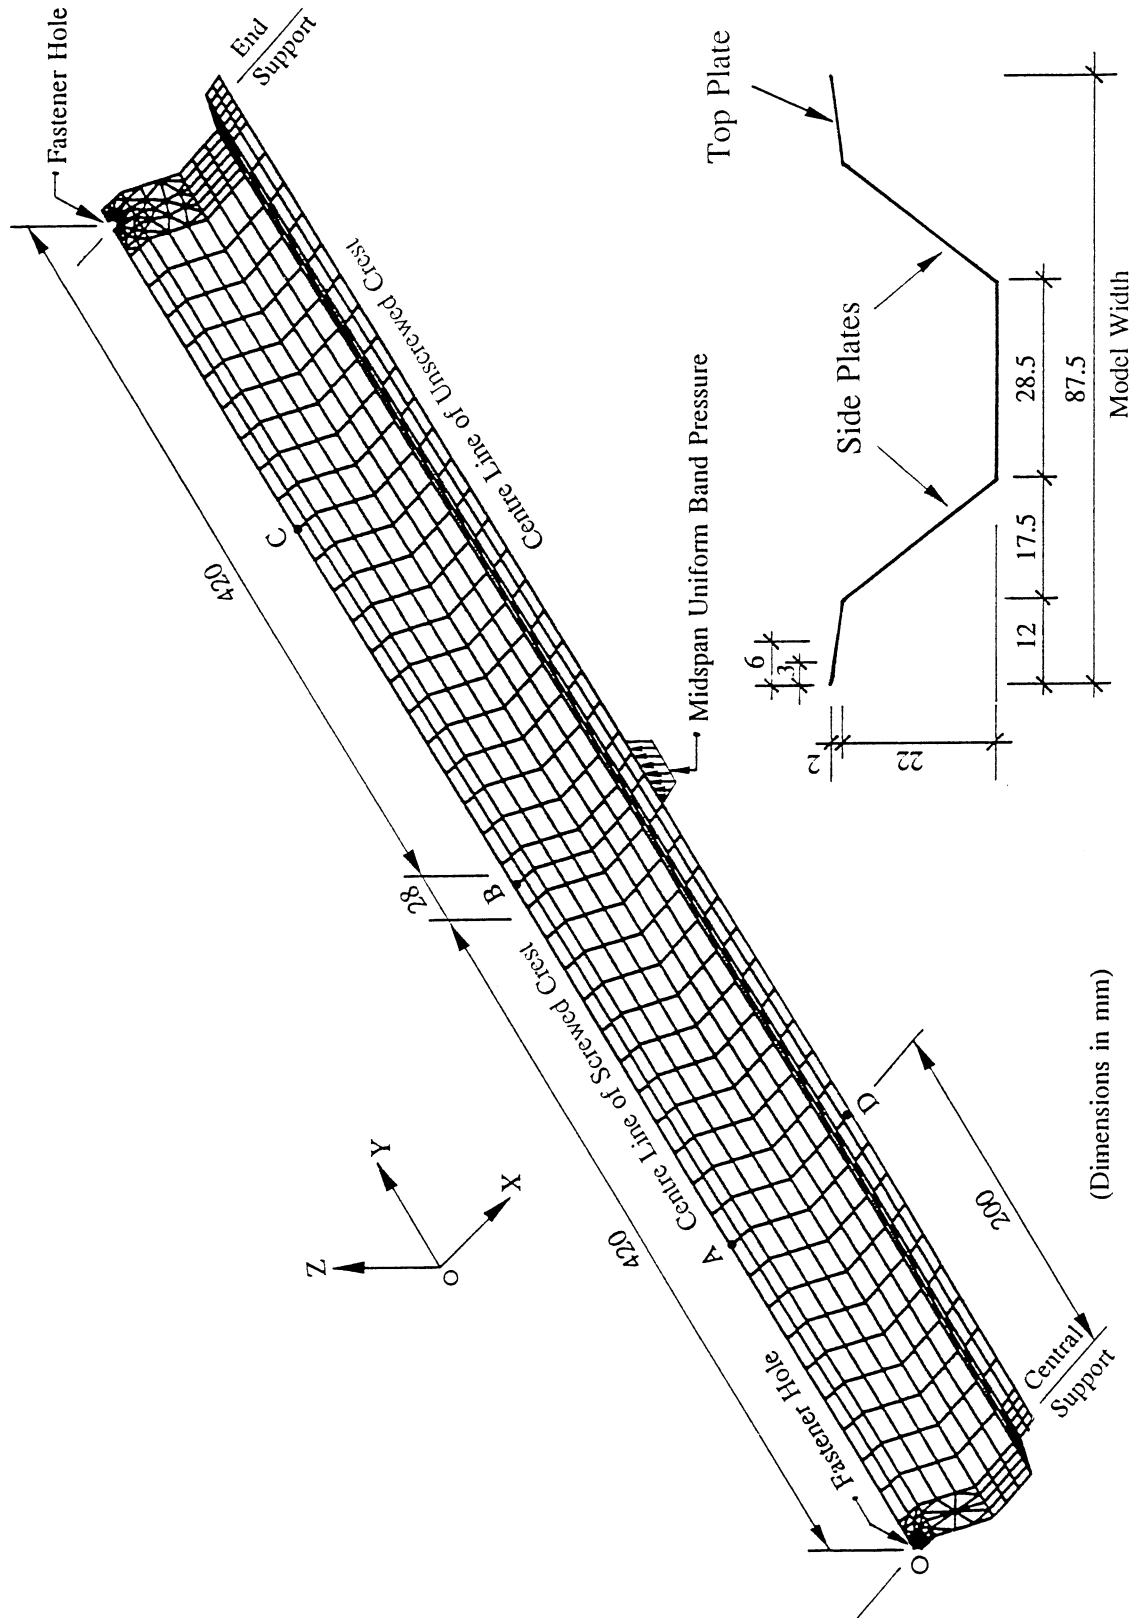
FINITE ELEMENT MODEL OF TRAPEZOIDAL PROFILE ROOFING SHEET
